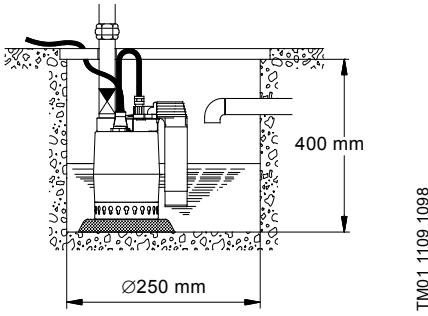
Minimum tank dimensions, Unilift KP-AV
